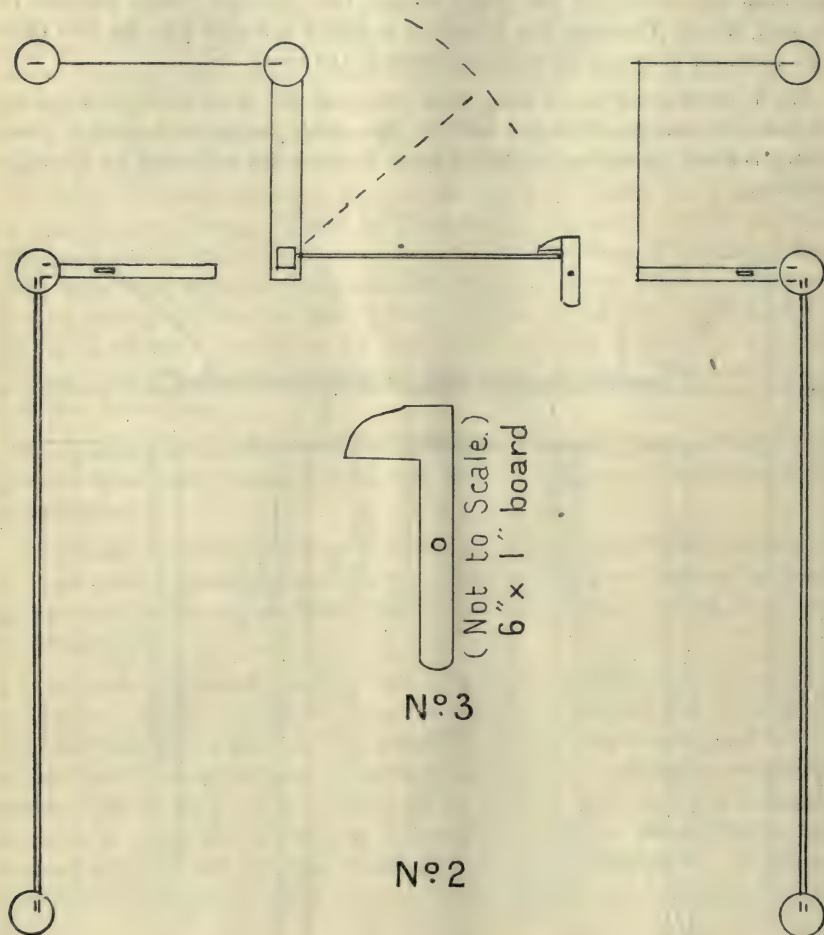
shows the latch, which can be made of a 6 inch x 1 inch board, and fitted by a coach screw to the bail head.
